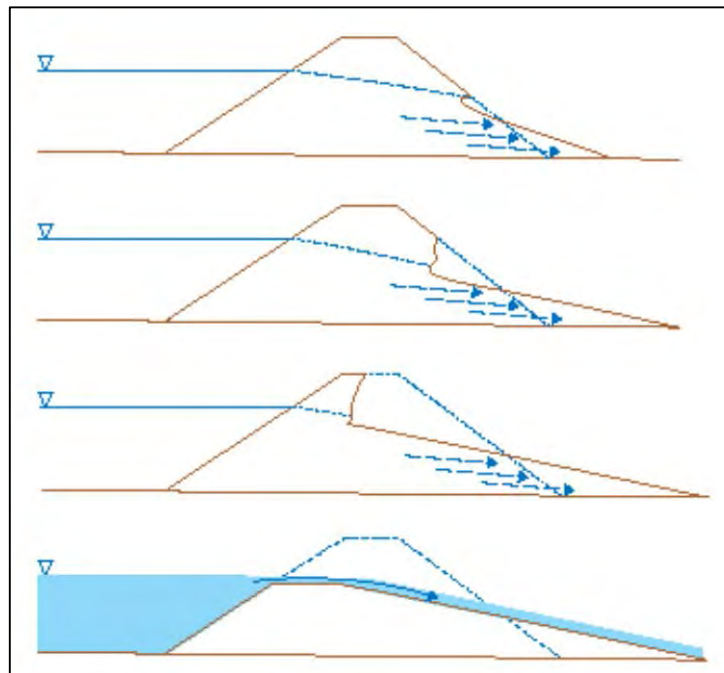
Illustration of how downstream sloughing due to saturation could lead to dam failure.
